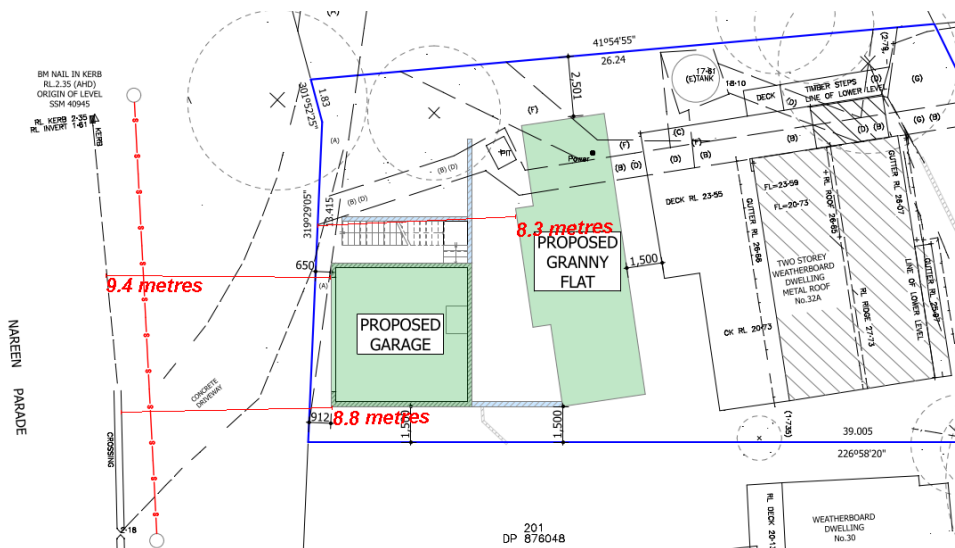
Extract – Site Plan Illustrating Front Setbacks
